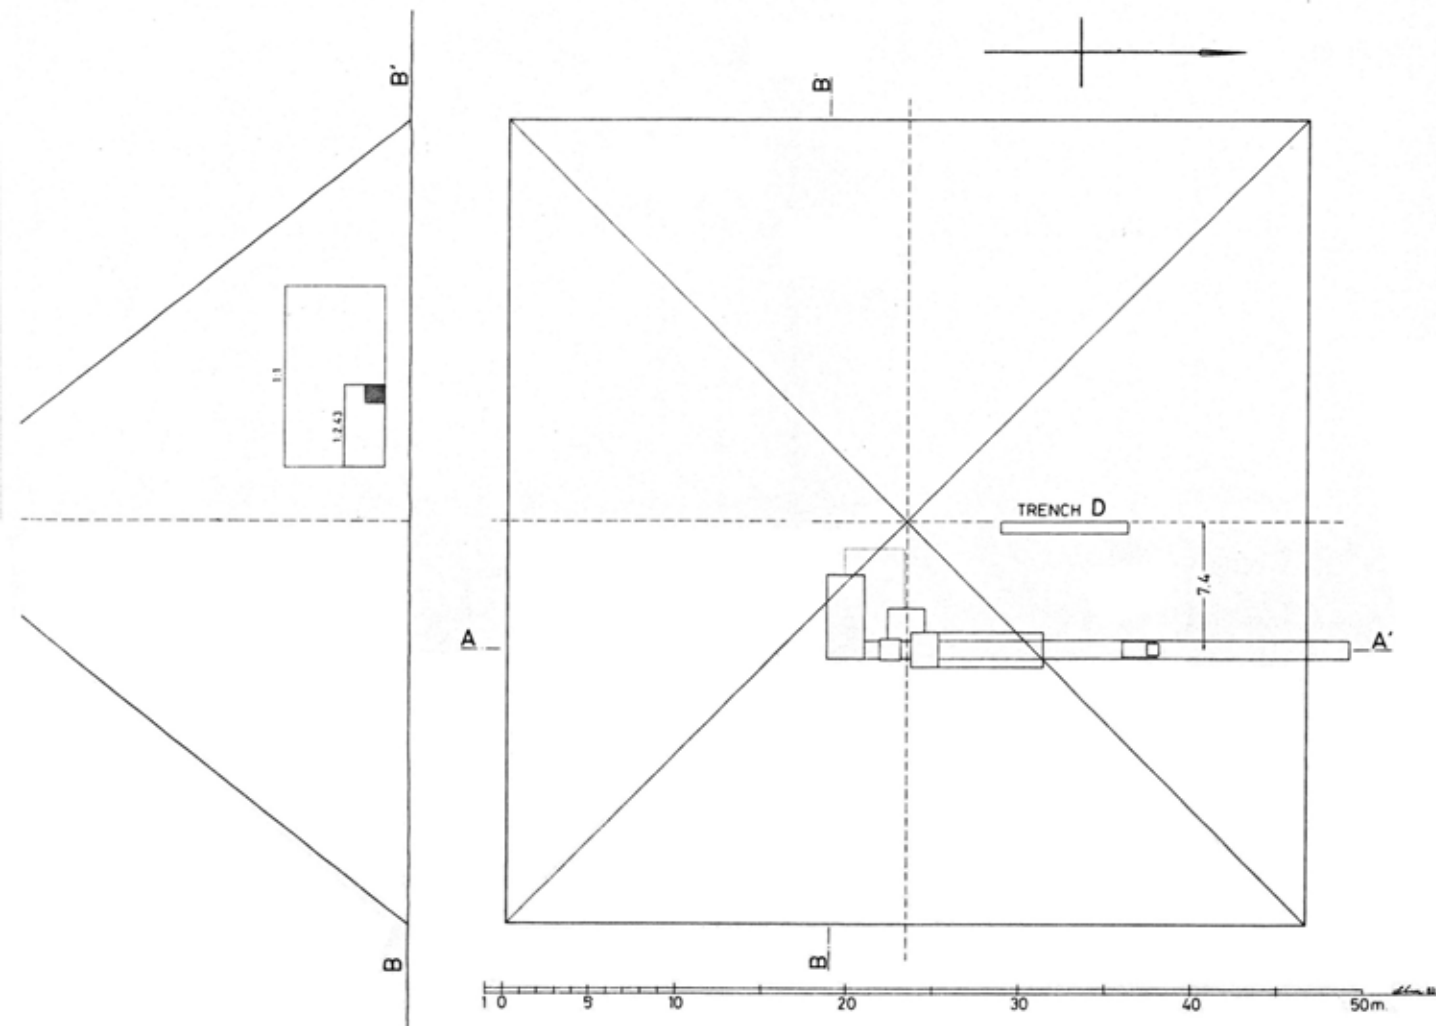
Khufu satellite pyramid reconstructed. Plan and cross-section.
